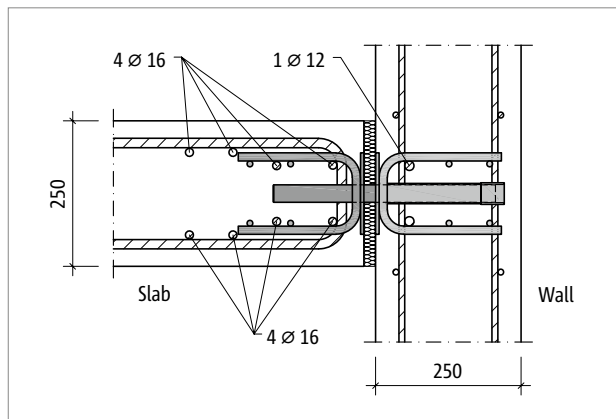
Section through floor-wall connection showing reinforcement set-up
